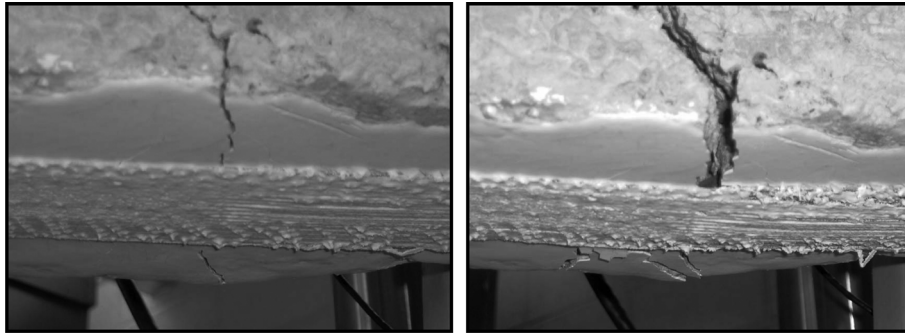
Crack opening in tension face of beam RB-2 (a) post cracking (b) post yielding
